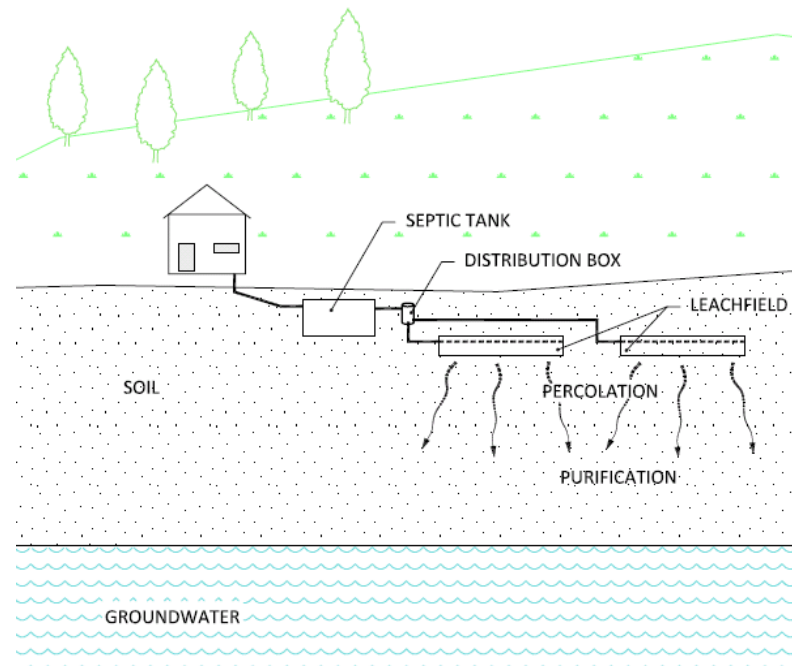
Typical On-site Septic Tank and Leachfield Disposal System Layout
